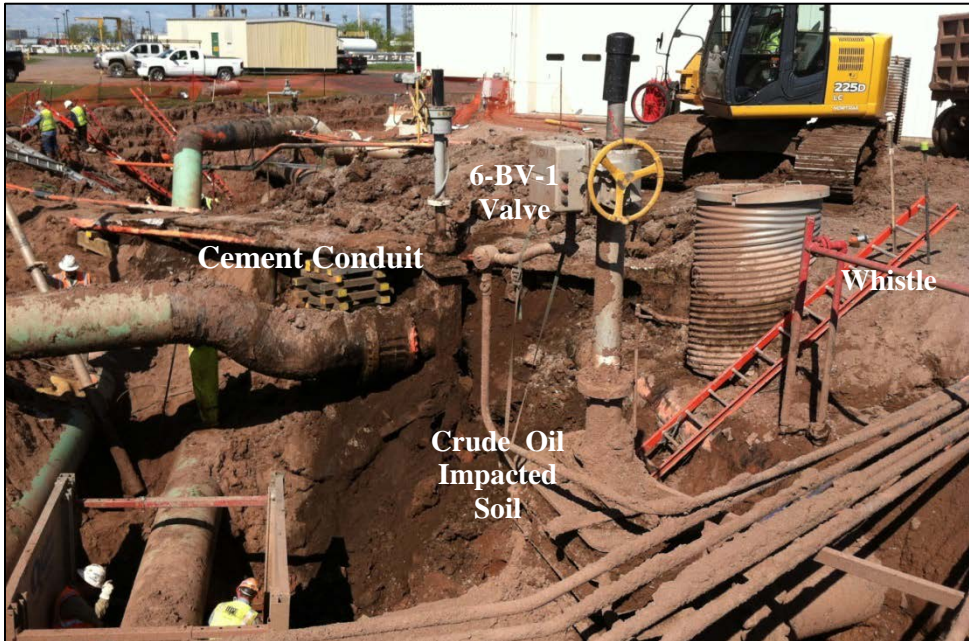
Line 6 hydrotest excavation facing west. Crude impacted soil was observed around the 6-BV-1 valve, the whistle and the the cement conduit as shown in the photo.
